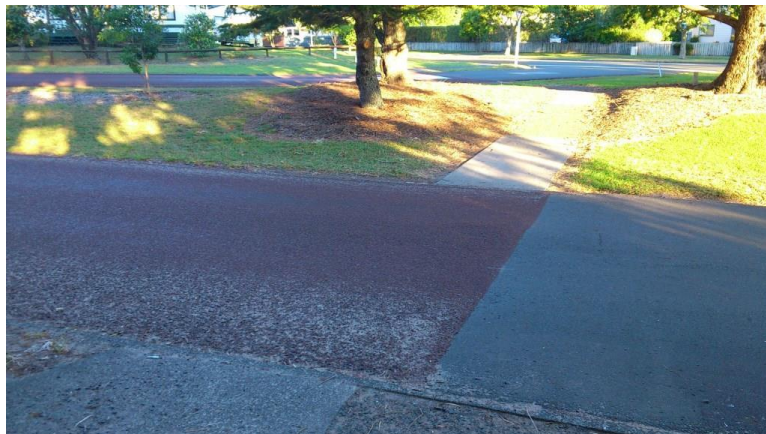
Crossing Pauanui Boulevard at the Vista Paku/Hikuai Settlement Road intersection
